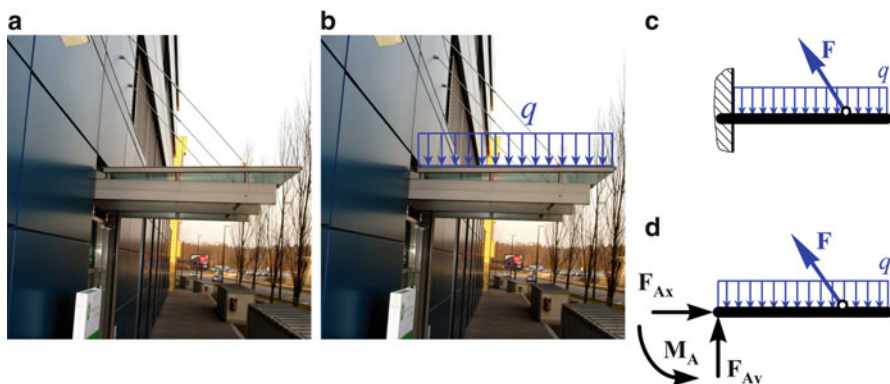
(a) A jutting roof over a door. (b) Cantilever beam loaded with $1/3$ of the roof weight. (c) Physical model of the cantilever beam. (d) Free body diagram of the cantilever beam
